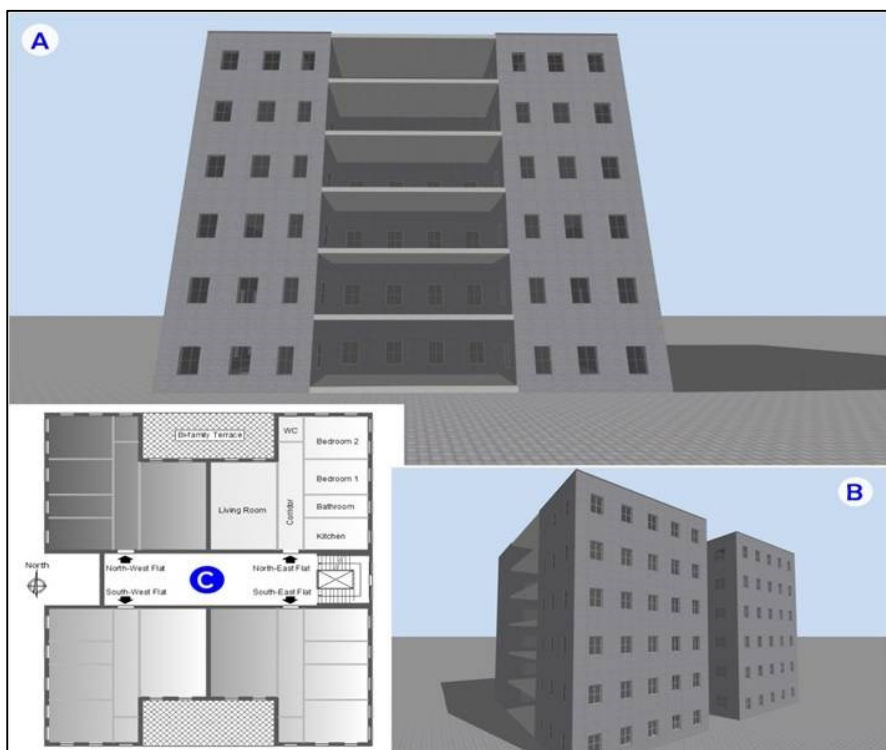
The modeled residential building: a) prospectus b) axonometric c) floor plan
